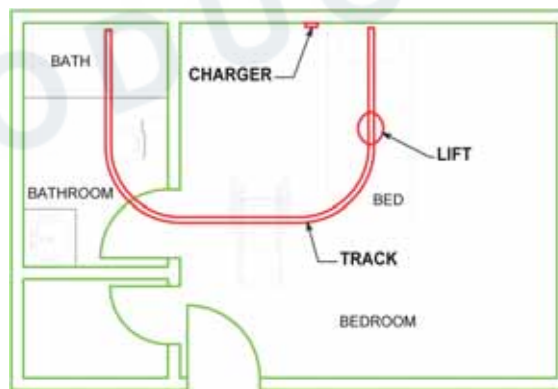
B – Alternate sample floor plan showing basic components of a ceiling lift system.
